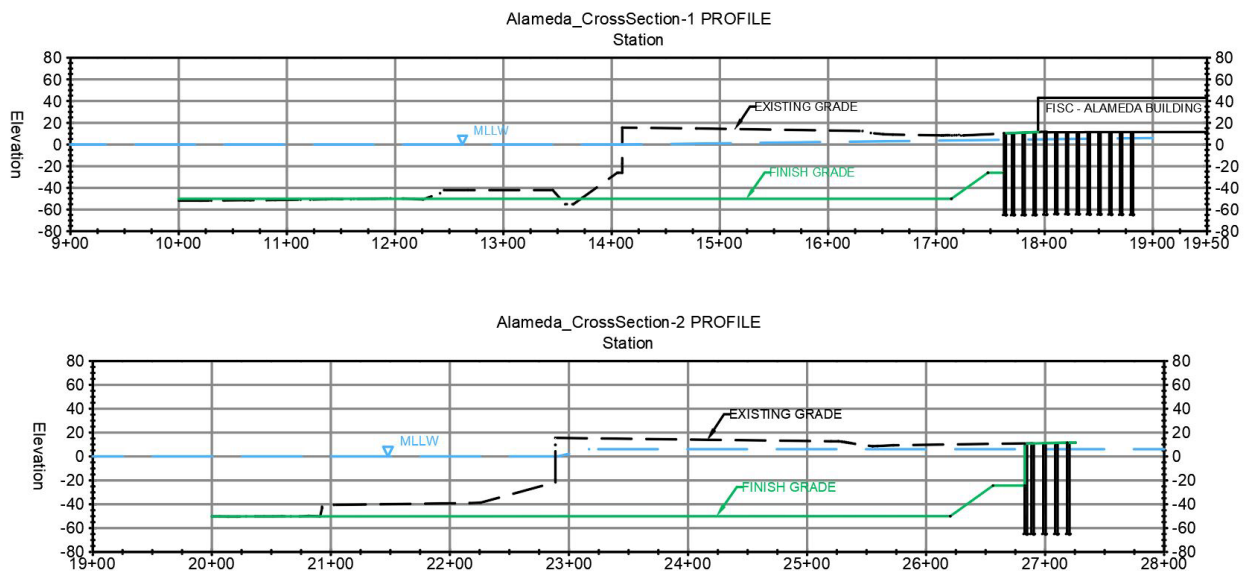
Alameda Wharf Proposed Design Typical Cross Sections
